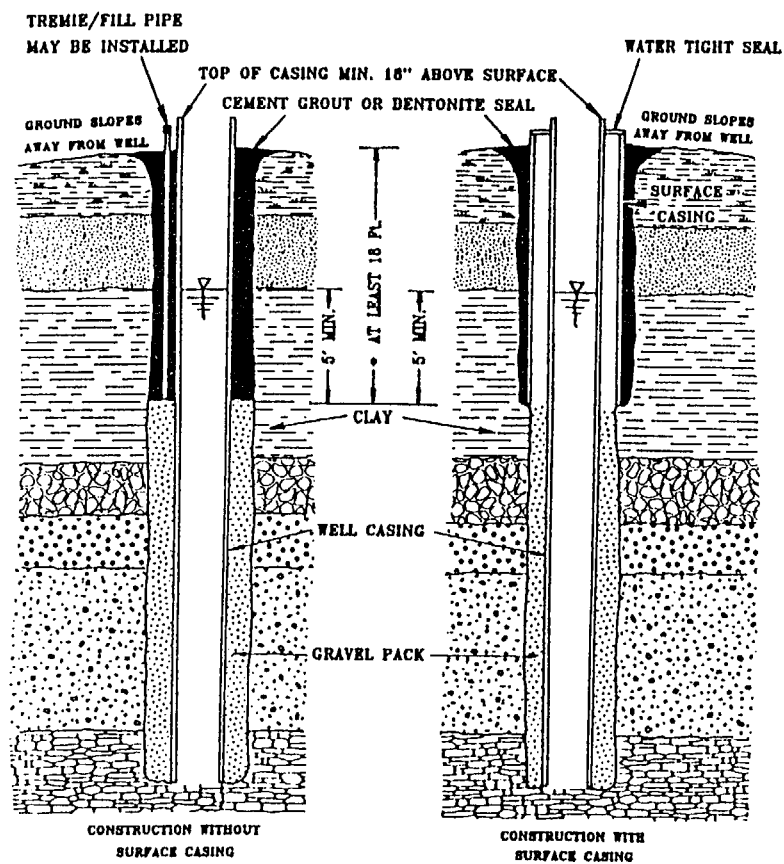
CONSTRUCTION OF A DRILLED WELL
